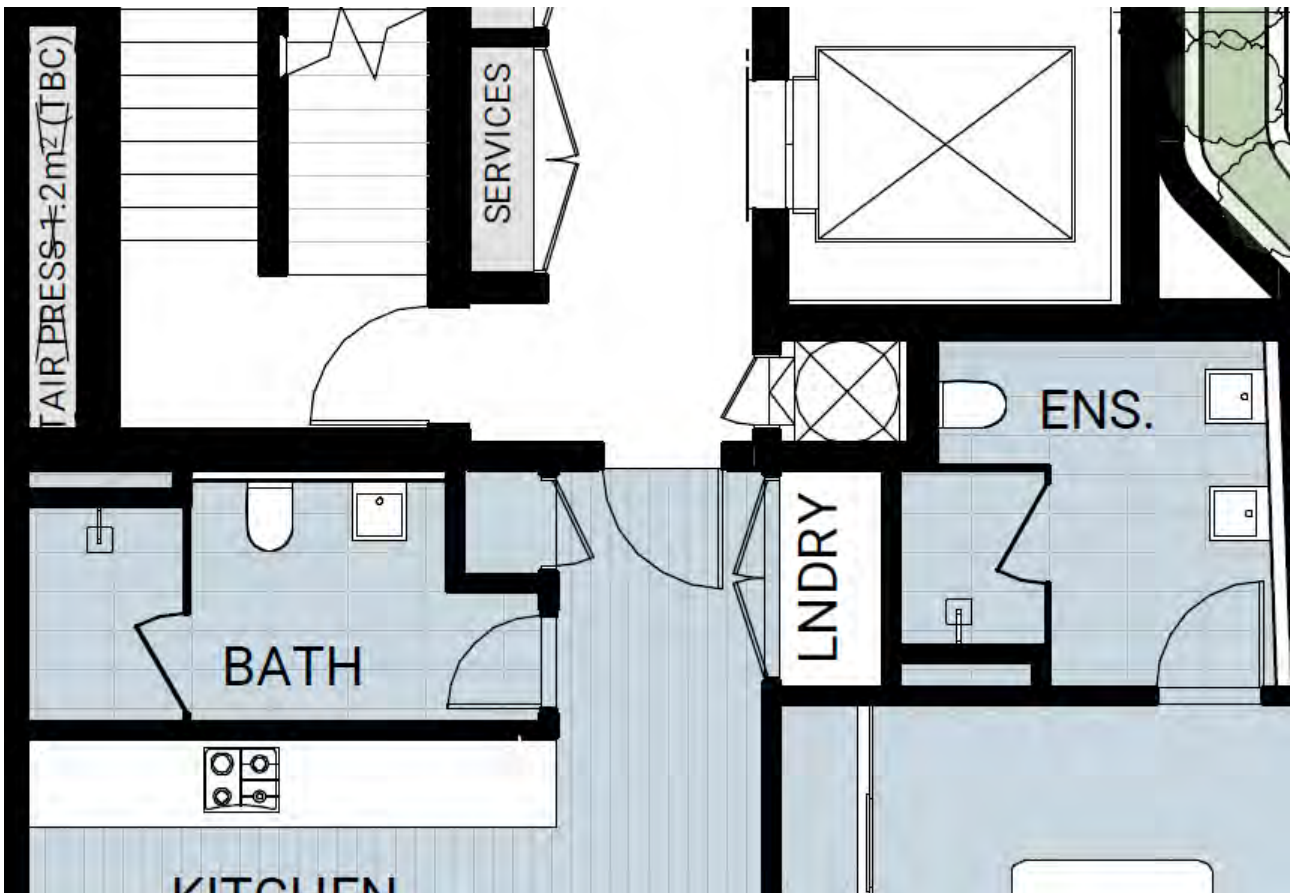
Typical diverter chute access hopper (Source: Plus architecture, DA102 Lower Level Typical Level 02-06 Floor Plan, Nov 2022)
